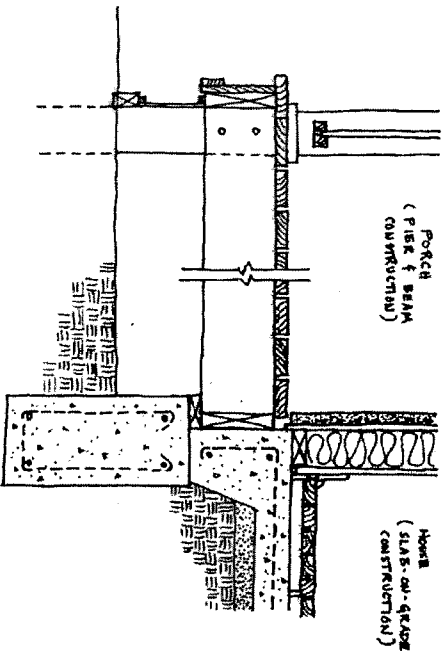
A combination foundation with a porch on pier and beam and the main structure on slab.
